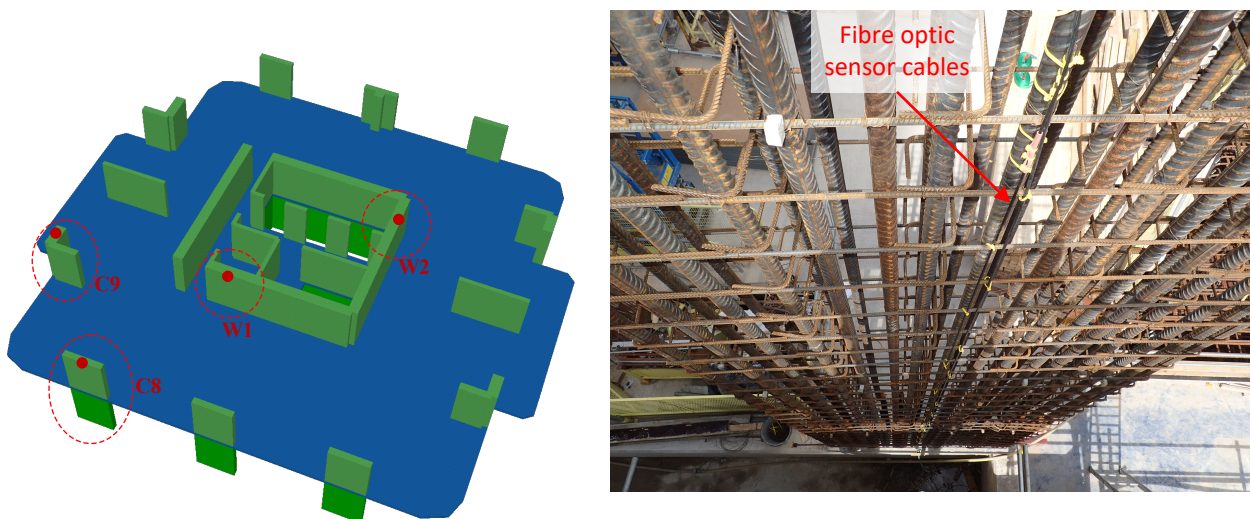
Location of the instrumented columns and walls (left), and the fibre optic cables tied to the reinforcement prior to concreting (right).
